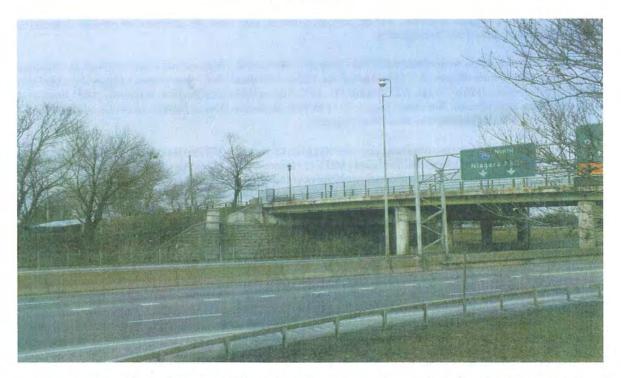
View of the southern parcel of the revised APE, facing northwest. The bridge abutment shown was constructed in 1897 for a former Porter Avenue bridge over the Erie Canal (Historic Photo 6). If they still exist *in situ*, canal walls will be found below the railroad bed at the west end of the bridge.
